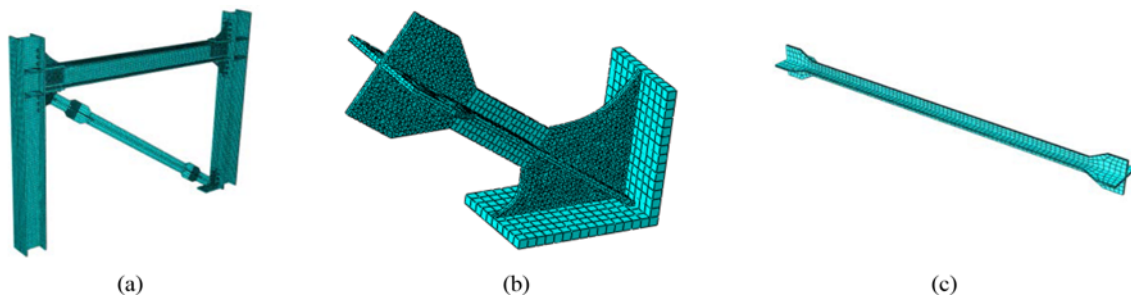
Finite Element Model: (a) Frame, (b) Ductile Casting, (c) Core of BRB
